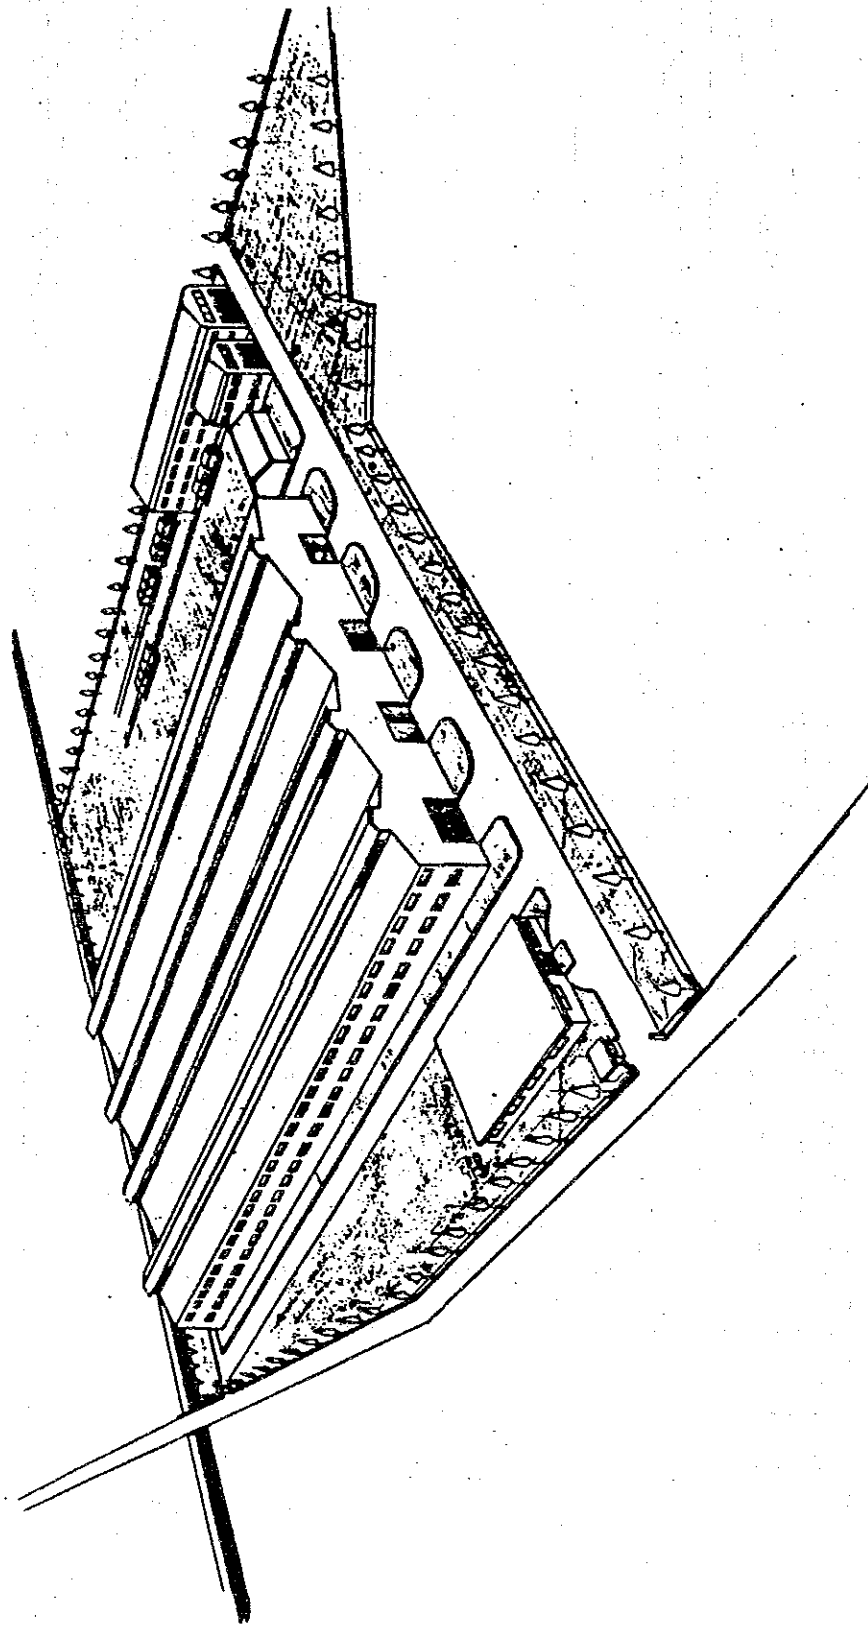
BIRD'S VIEW OF SHOP BUILDING
